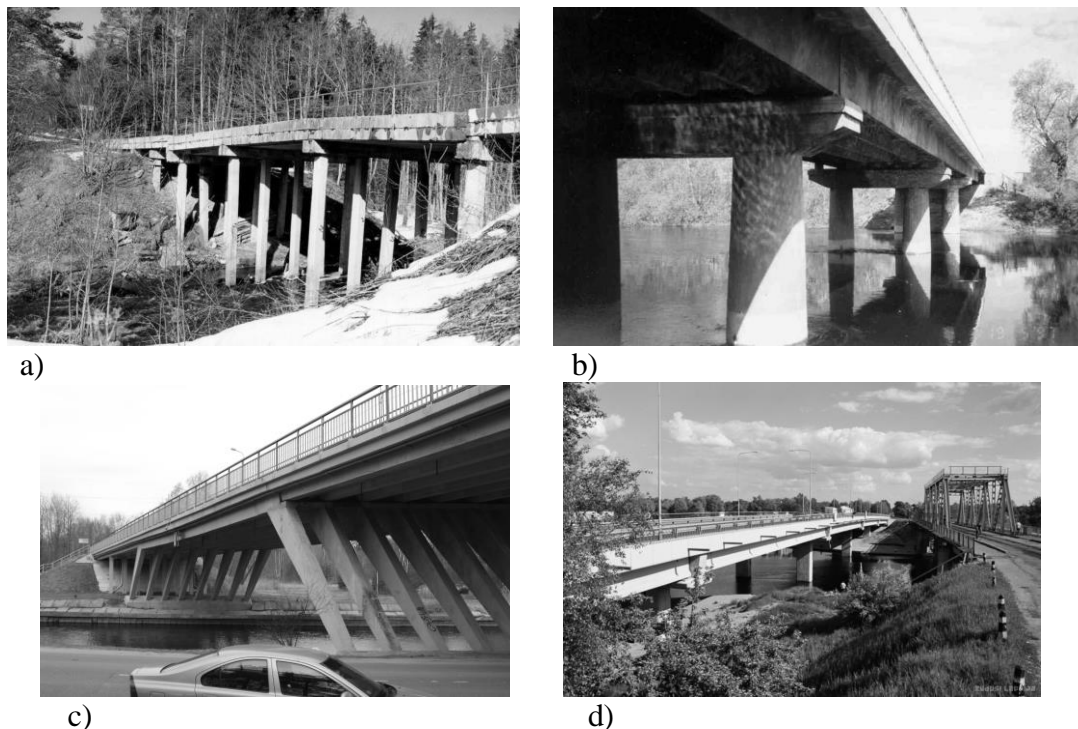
Examples of the bridge piers in Latvia in the period from 1941 until 1991: a) Bridge over the river Riezupe in Kuldiga region; b) Bridge over the river Aiviekste; c) Bridge over the Channel Kisezers-Baltezers; d) Bridge over the river Bullupe [7]
